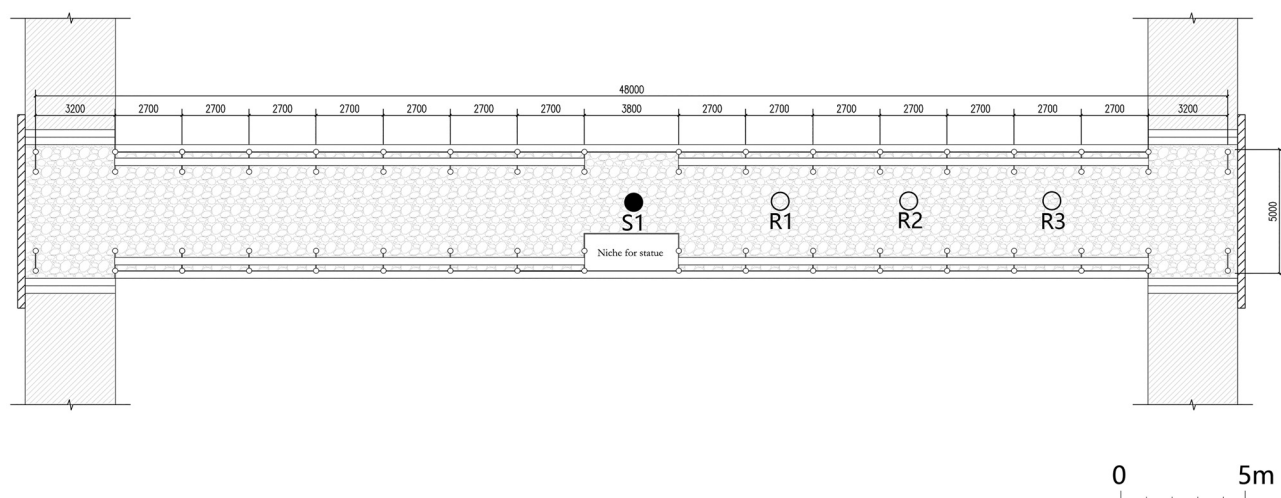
Floor plan of the standard acoustic model of the CITAC bridge and layout of the sound sources and receivers.
